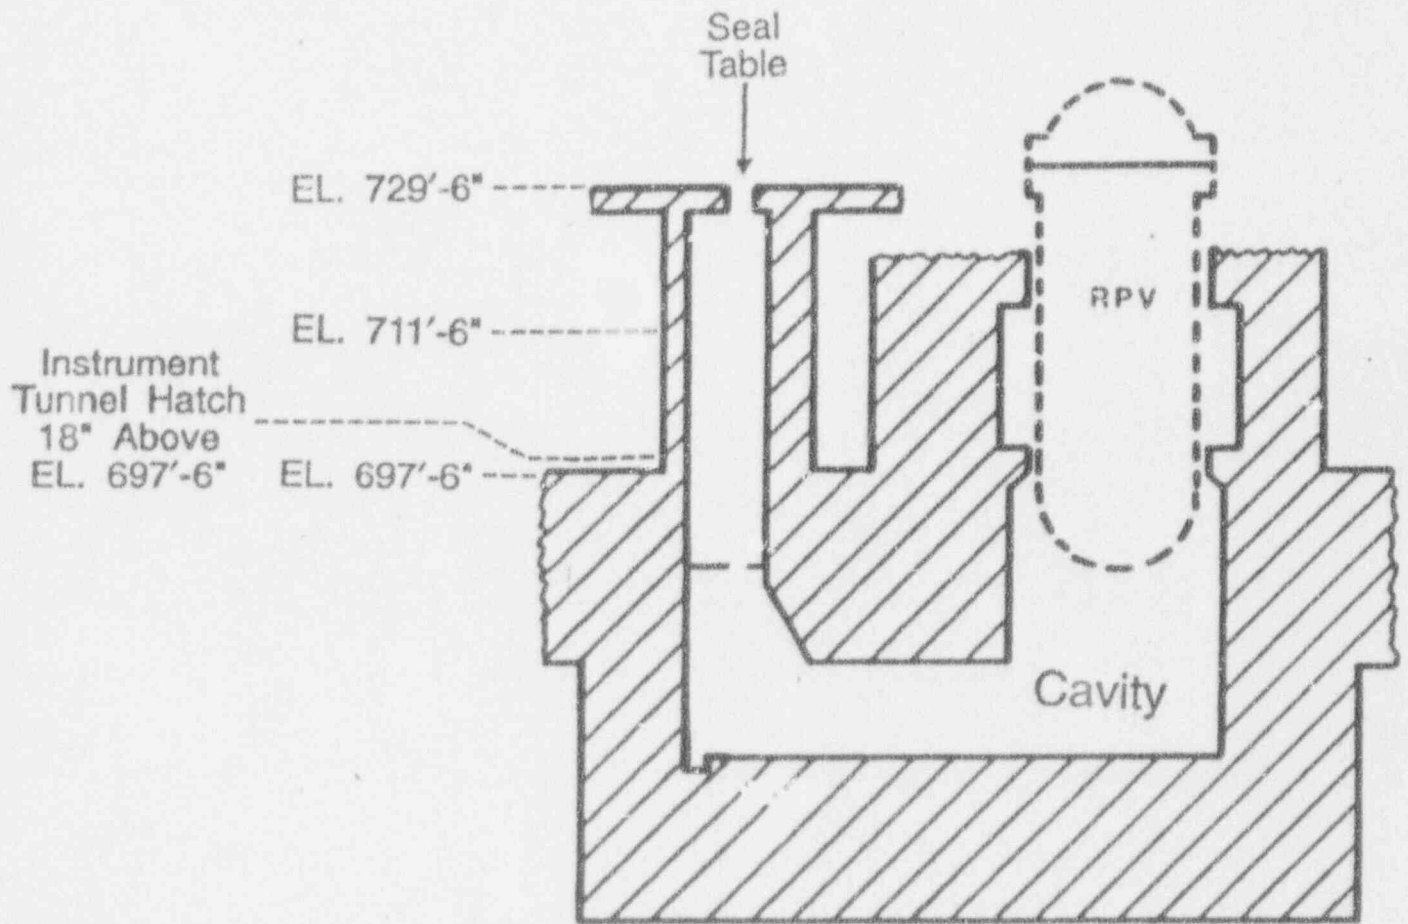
Geometry of the Prairie Island cavity and instrument tunnel
